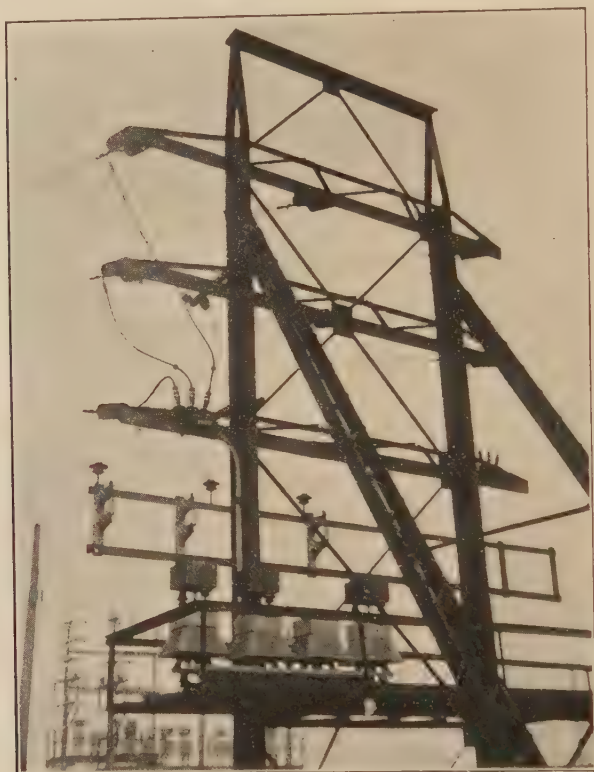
Strain tower used as terminal for underground cable to overhead river crossing.
